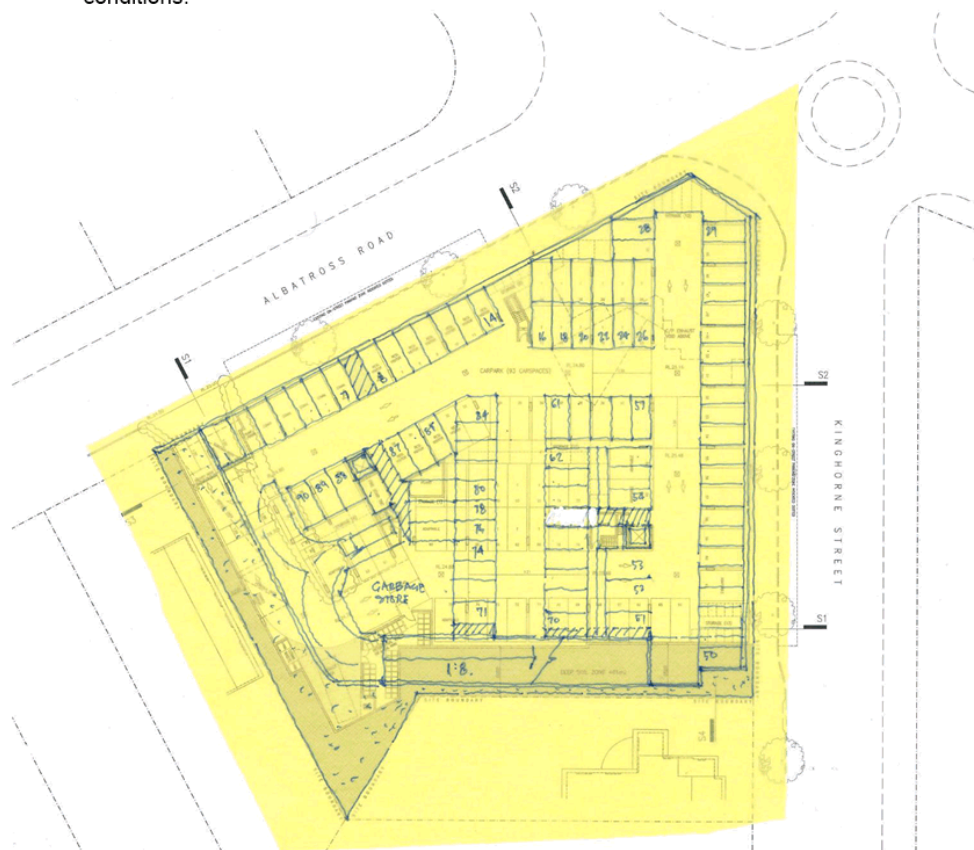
applicant's submitted concept plan, demonstrating that access via Kinghorne Street (local road) is capable of being achieved.
